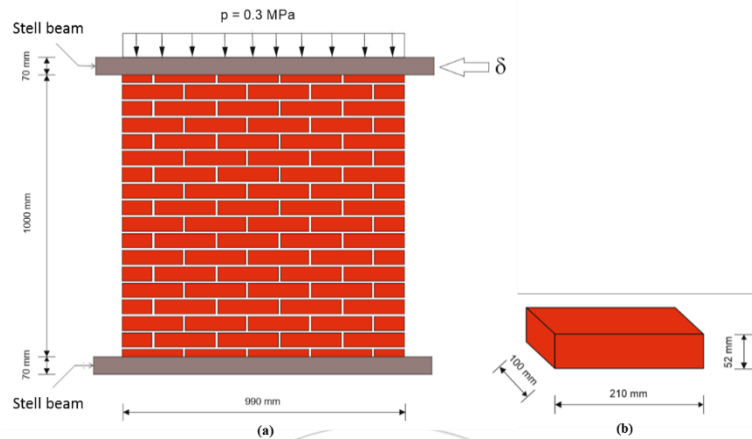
(a) Masonry wall geometry (b) masonry unit used in the wall
